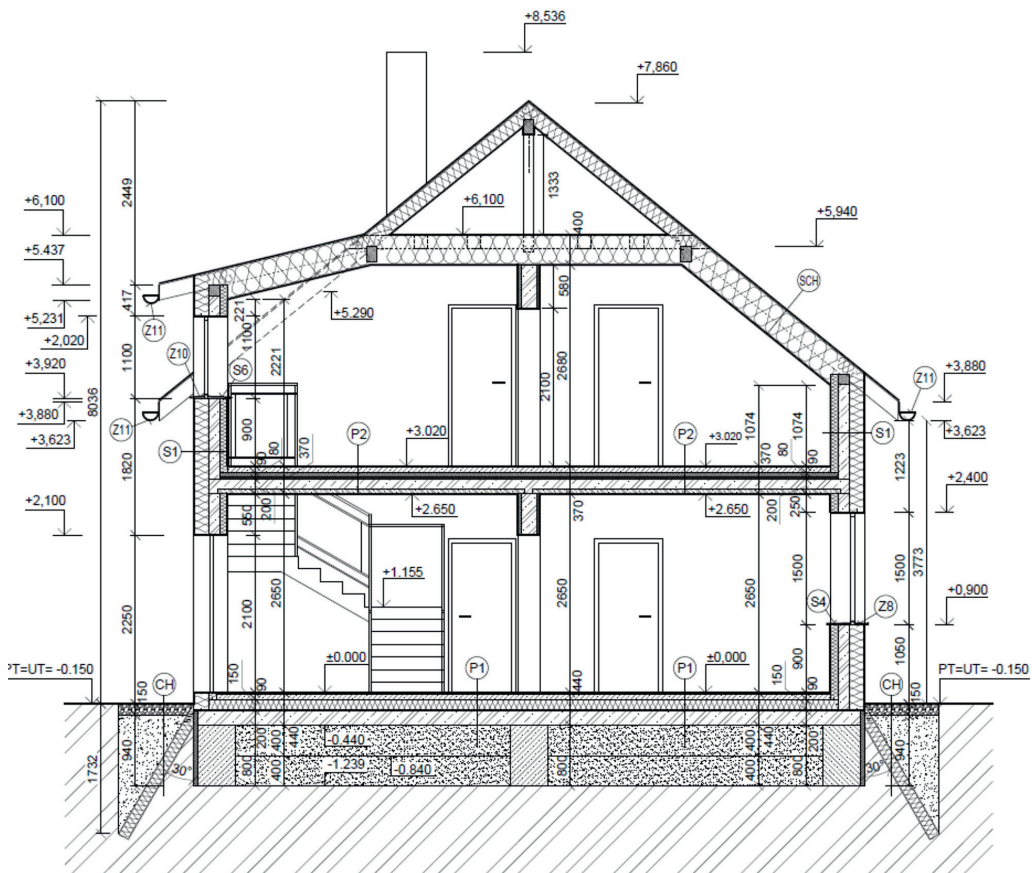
Prototype of prefabricated house IDA I. - cross section A-A' [2]
